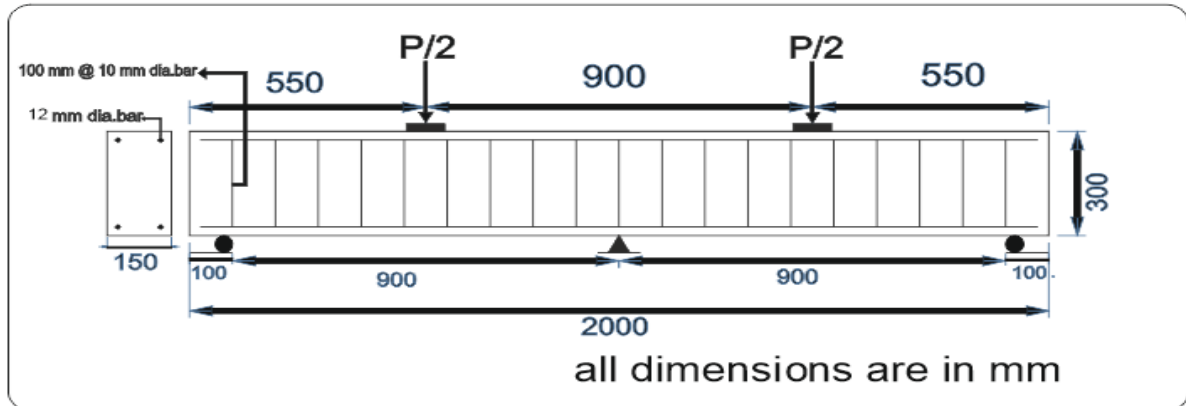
Geometrical dimensions and reinforcement details of the continuous deep beams
